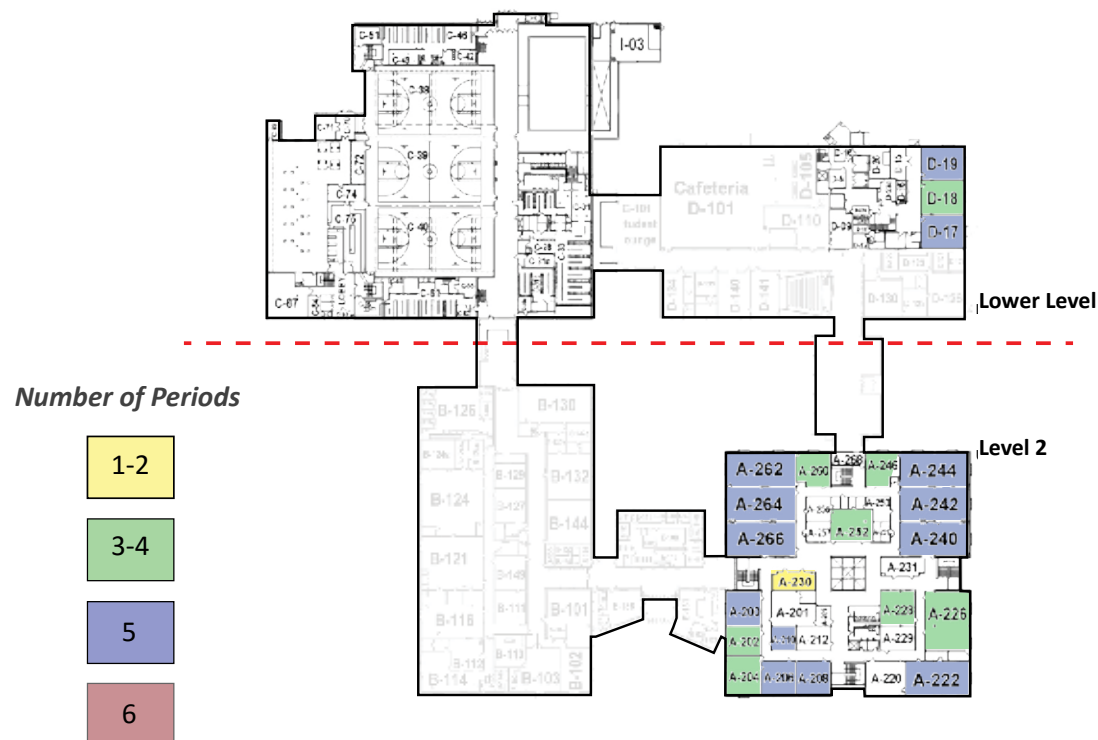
Brainerd High School Level 2 - North Campus. Existing Utilization Plan
